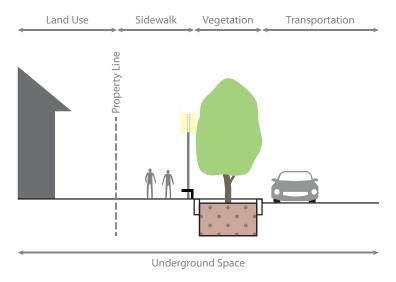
An example of a street envelope: design considerations in Green Street practices including land use, sidewalk, planting area, roadway, and underground space.
